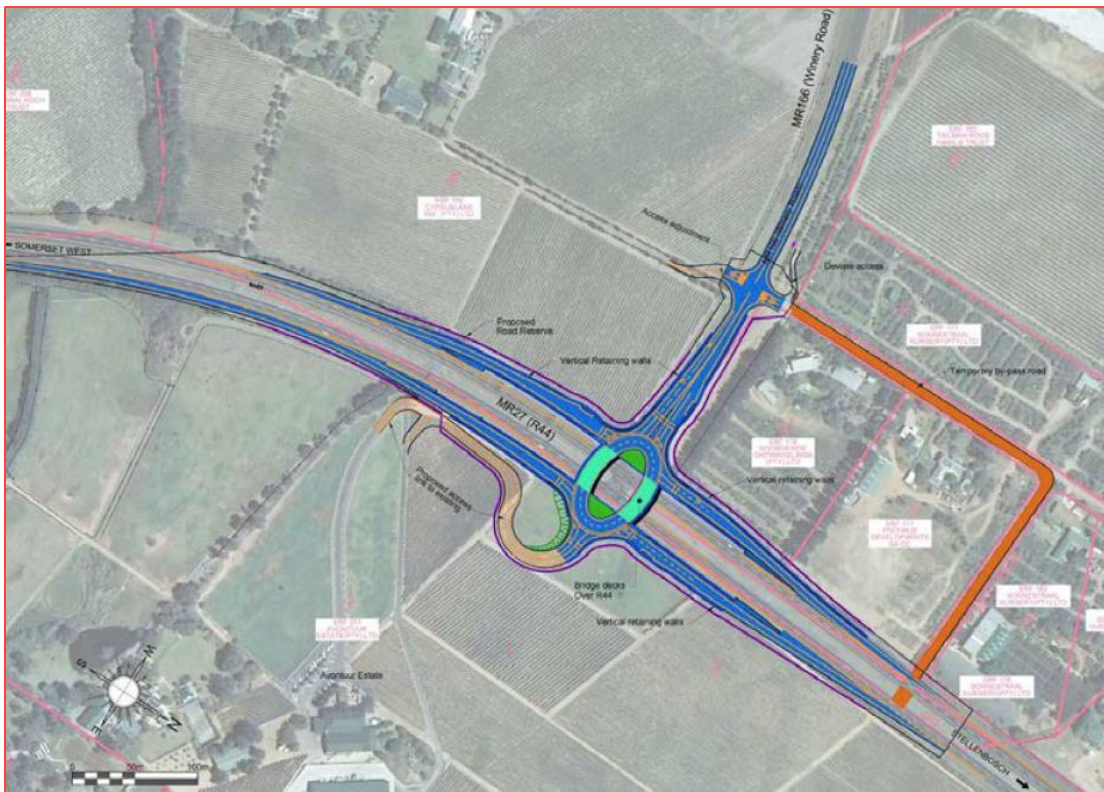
R44/Winery Road grade-separated roundabout with vertical retaining walls
